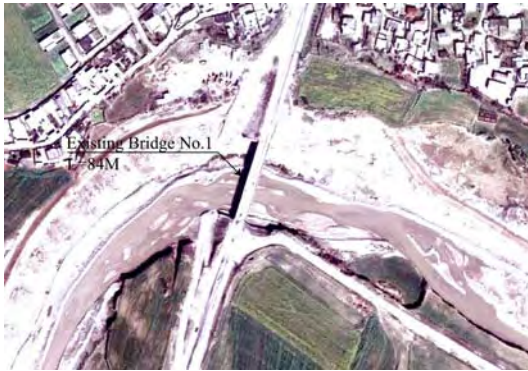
Satellite Image of Existing Bridge No.1 (Kalaleh Bridge)
